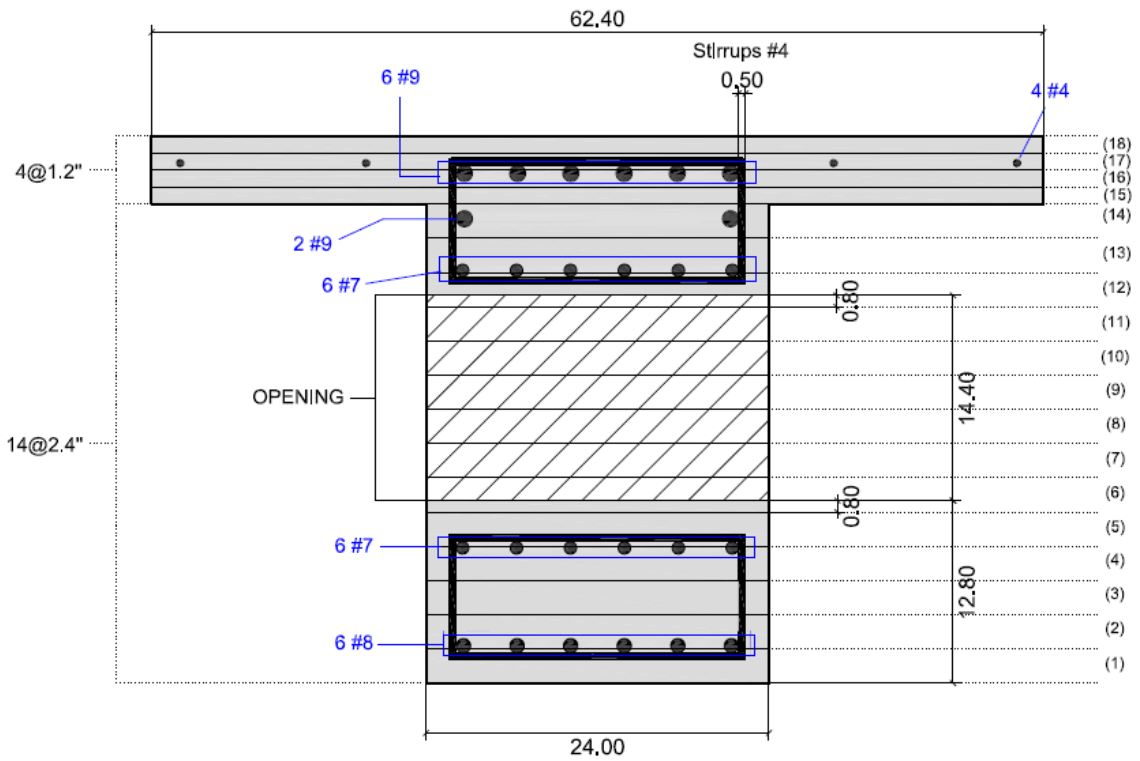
Cross section 5 for Specimen 6. Dimensions in inches.
